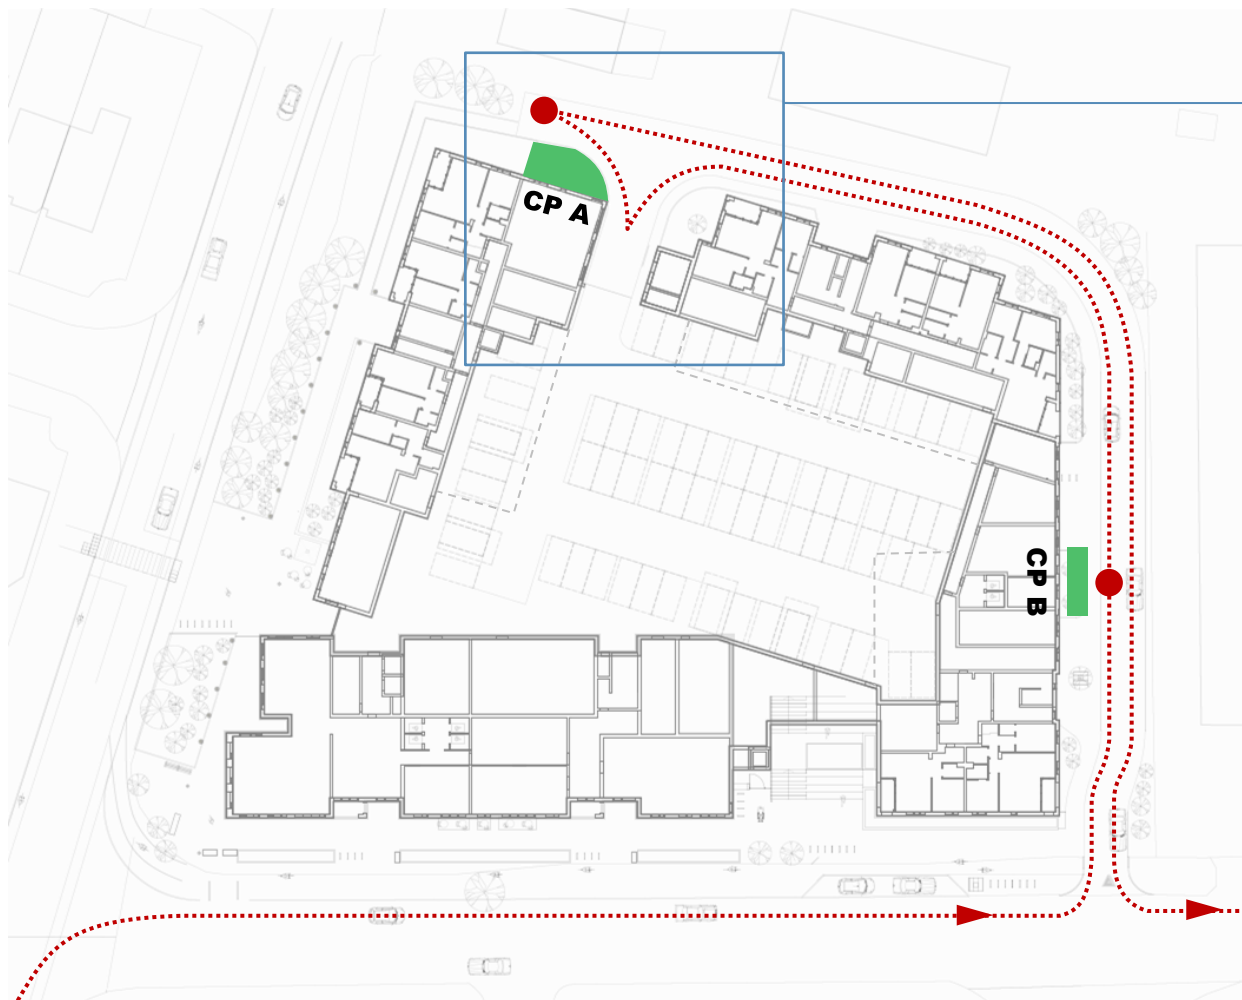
Ground Floor Plan highlighting Collection Points + Refuse Pick-up Locations | NTS
